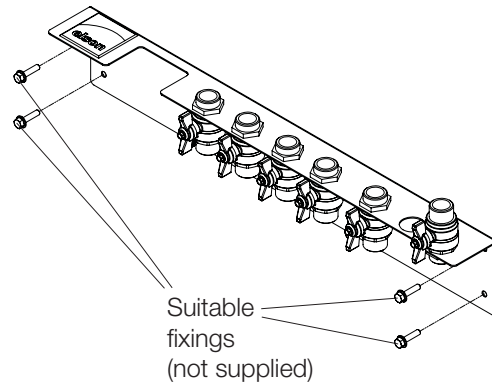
CB Heat Interface Unit - Mounting on the 1st fix rail
